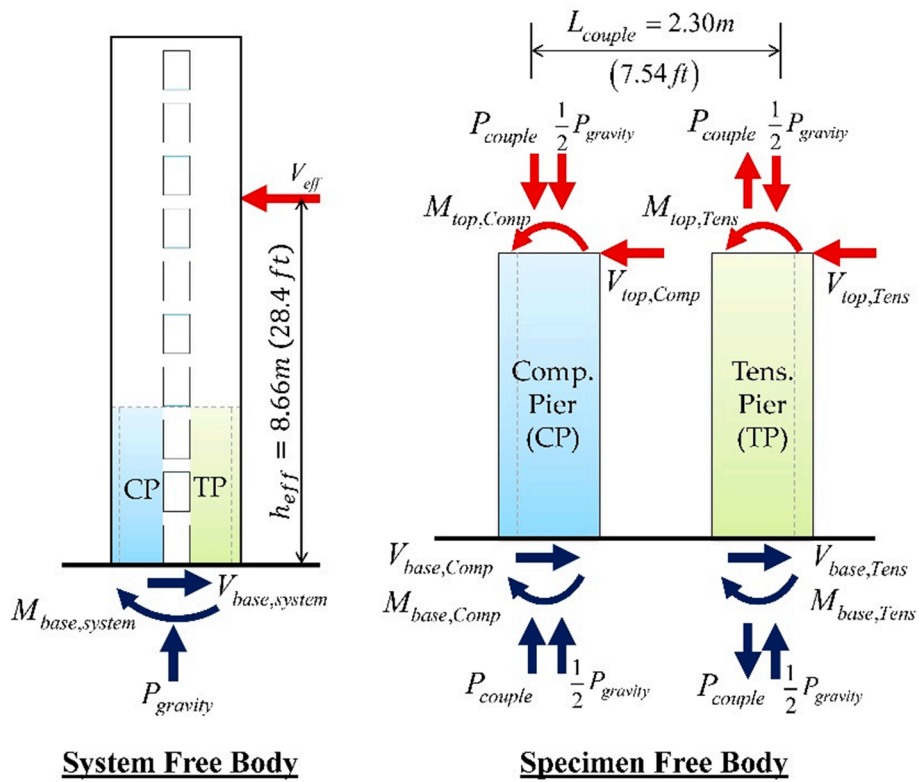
Free body diagram for 10-story coupled wall system and 3-story wall pier specimen (subject to compression or tension).
